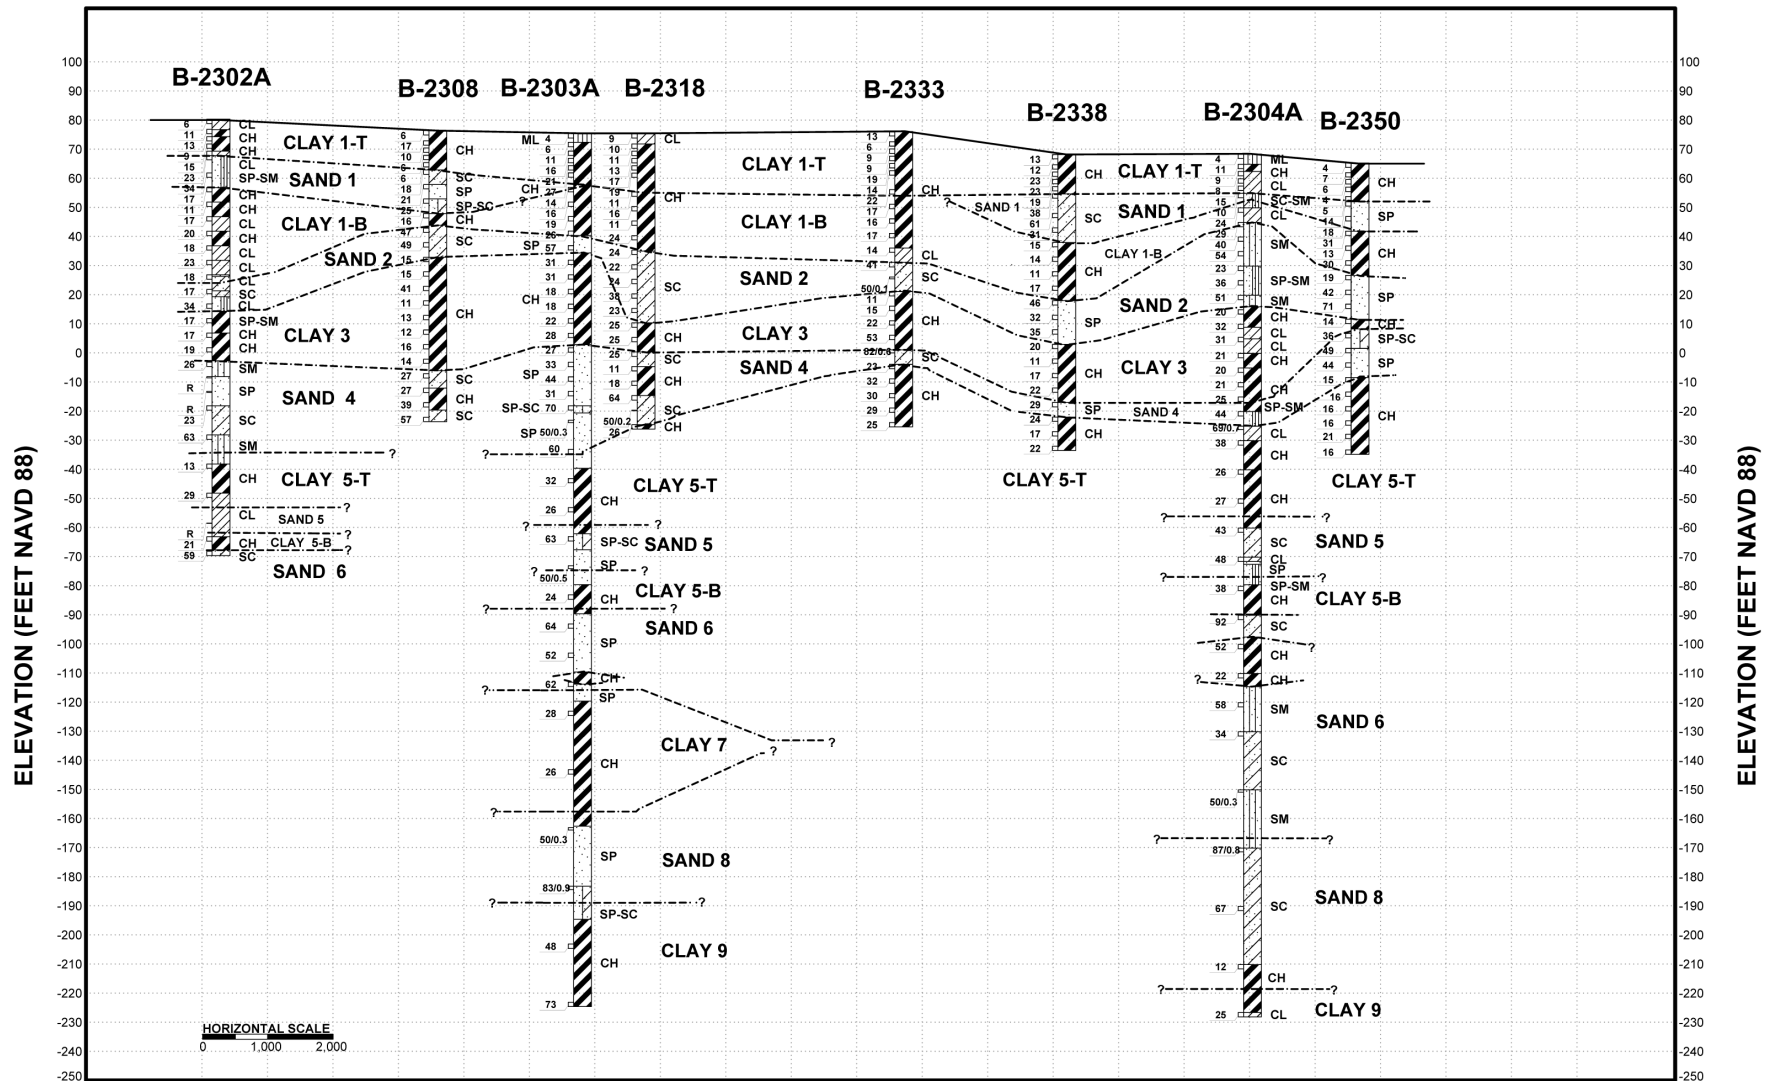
Subsurface Profile Plan E; West Embankment Dam of Cooling Basin (North-South)
